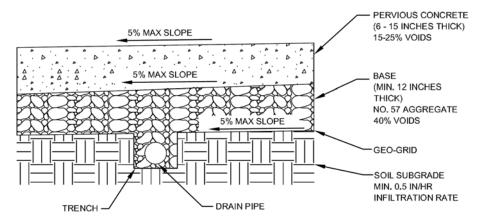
C. Pervious Concrete with Trench Outlet
